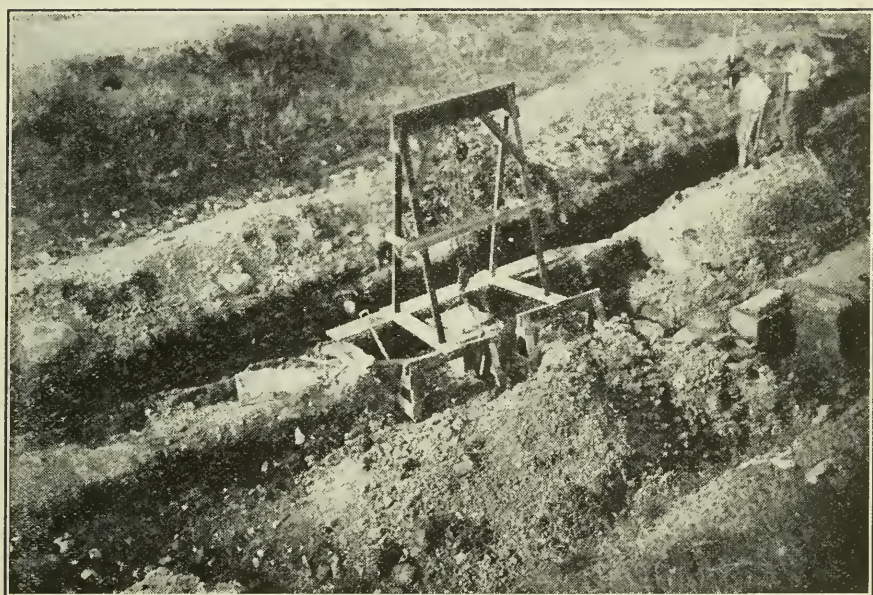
CLAY SPECIMENS READY FOR TENSILE TESTS.
